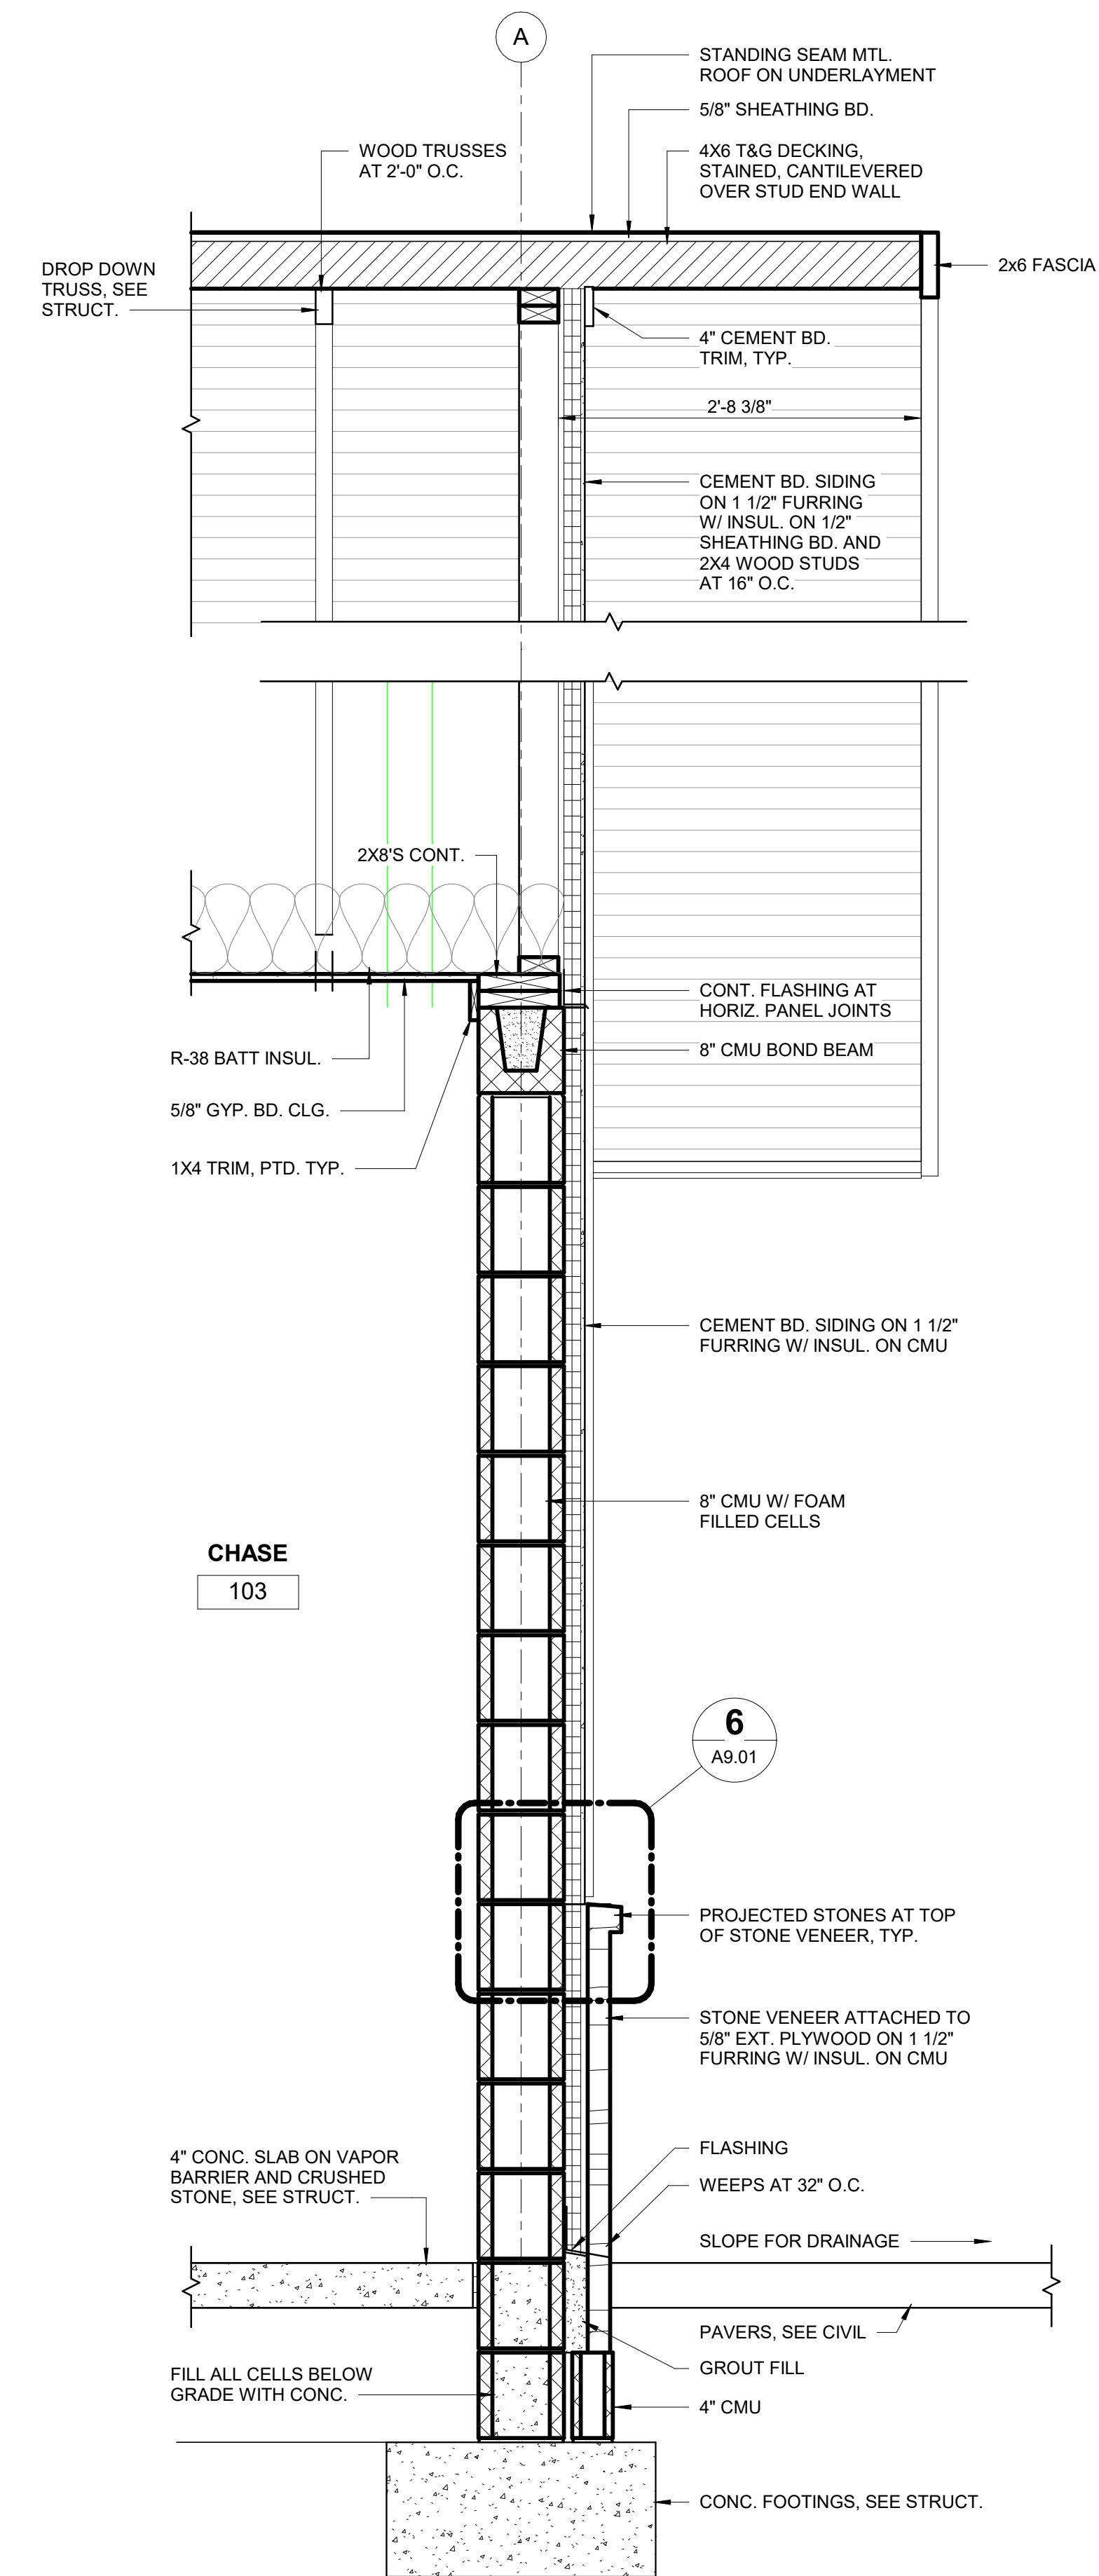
CONCESSION / RESTROOM WALL SECTIONS
